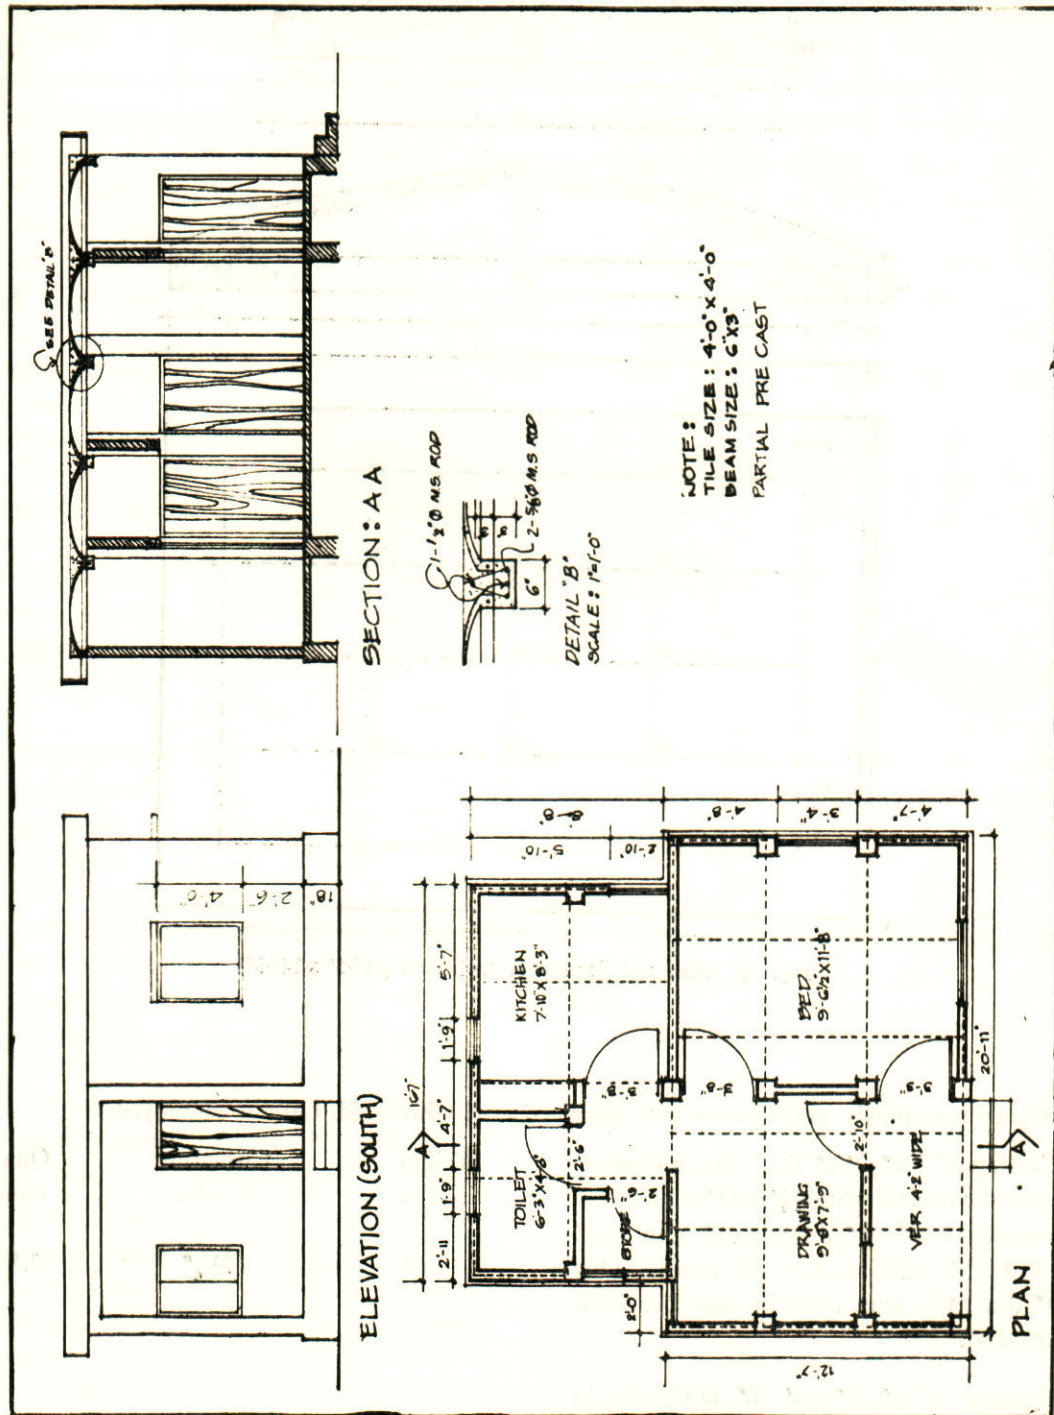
Plan and section of a house (395 sq. ft.) with D.C. shell roof.
